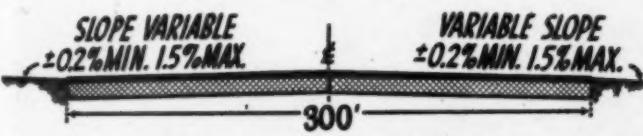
Standard Cross-Section of Aprons, Taxiways, and Runways. This is a Standard Cold Mix Asphaltic Concrete Cross-Section of the Alabama State Highway Department.
